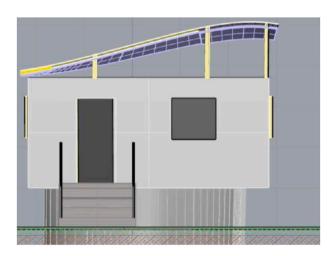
Blade with 'fillet' cut, used as roof section (Bank et al., 2019).
